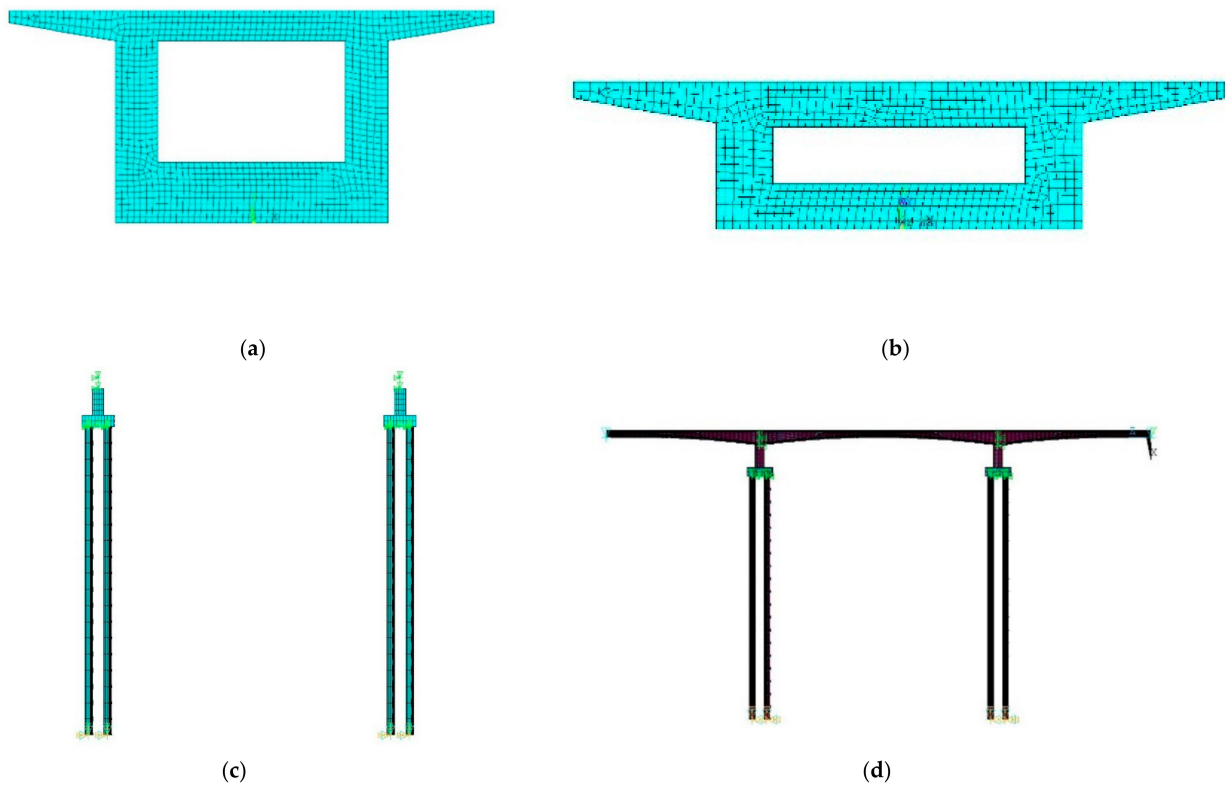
The finite element models of the bridge. (a) cross section of the box-girder at bearings. (b) cross section of the box-girder at midspan. (c) bridge piers. (d) overview of the FEM.
